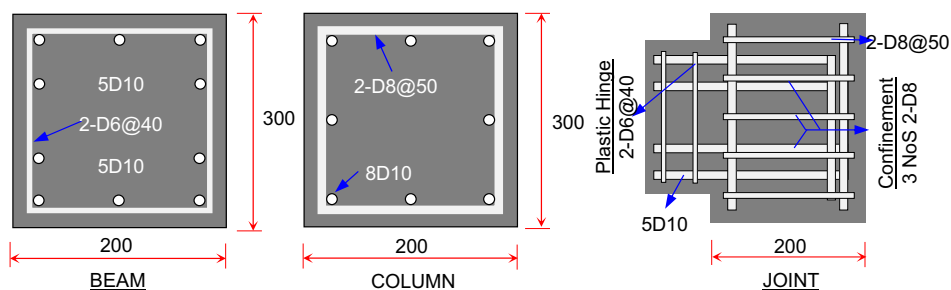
Schematic cross-section dimensions and bar layouts in specimen HW/RC025d (adapted from [12]).
